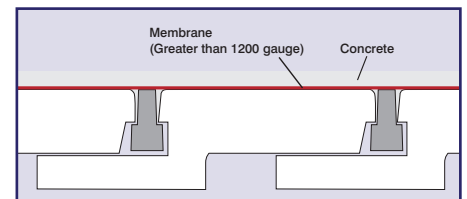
Floor construction using Poly Plus F/T Flat Top Panel with rigid membrane barrier
